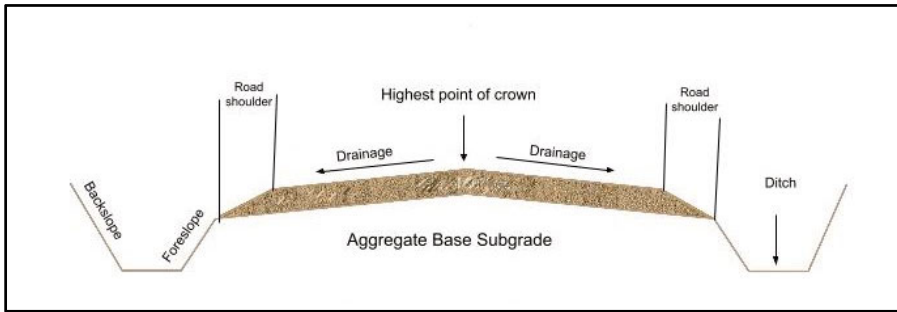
Cross-section structure of a gravel road section (Saeed et al., 2022)
